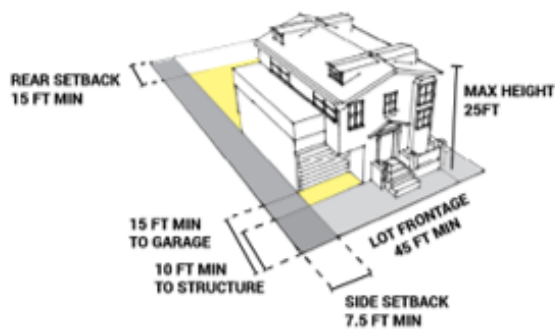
Illustration of Setbacks for Dwellings with Rear Loaded Alley Garage
